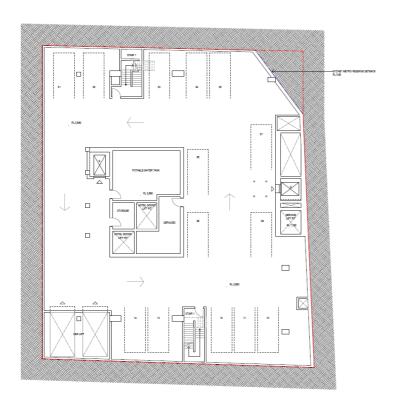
| Proposed basement level 4 (Source: Woods Bagot)
